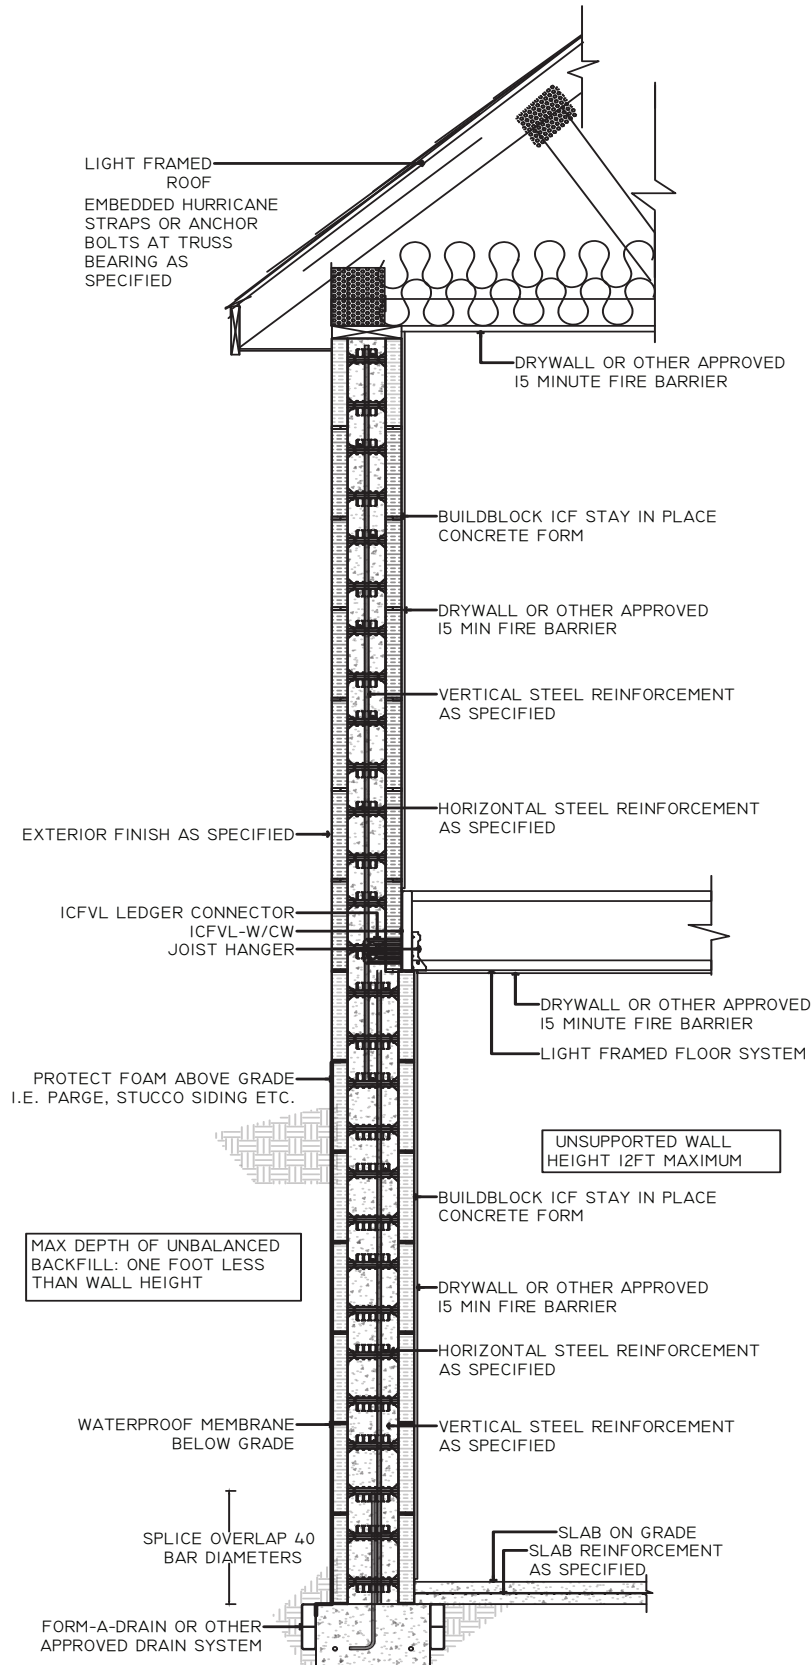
LOAD CASE 3. SECTION CUT THROUGH FLAT WALL OR VERTICAL CORE OF SCREEN GRID WALL. SUPPORTING 1 STORY OF ICF WALL.
